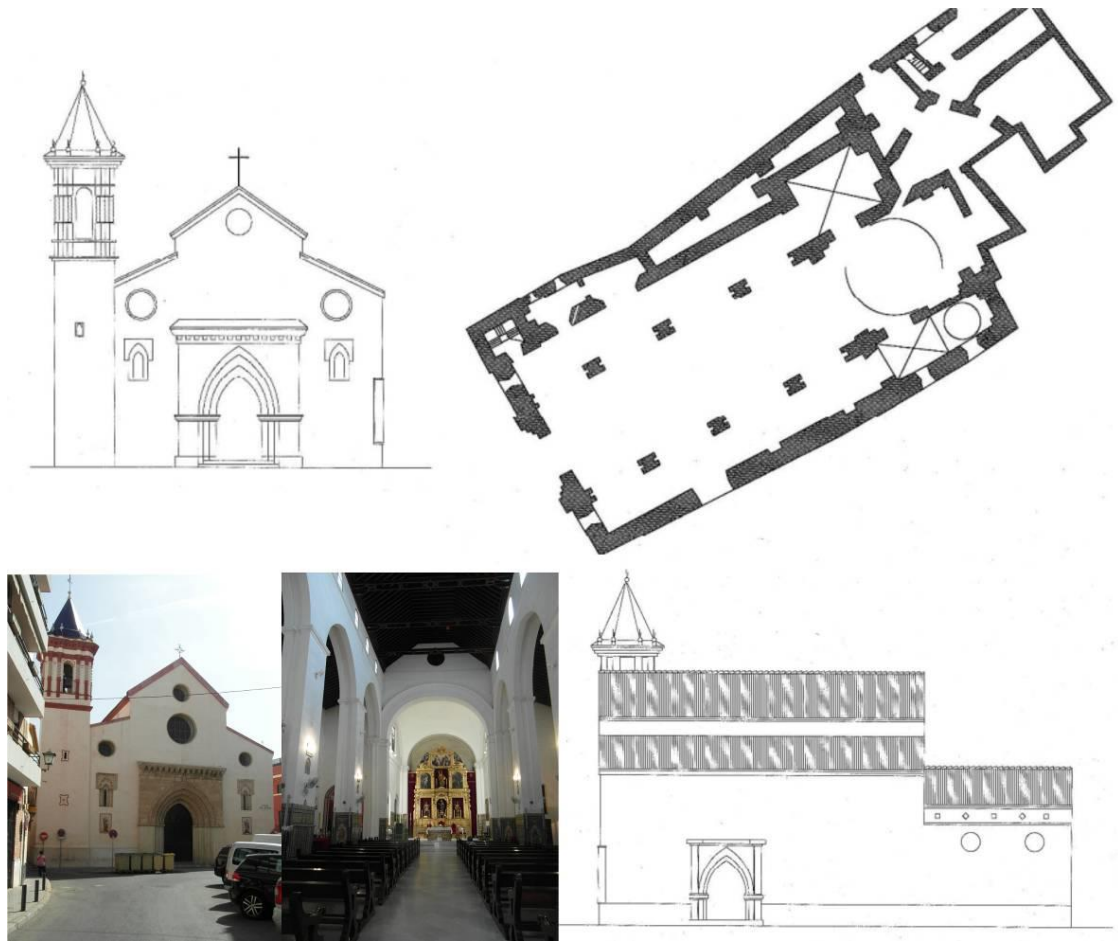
General views of San Román. Planes of floor and elevation (San Román PEPCH Sector 3 Santa Paula-Santa Lucía).
